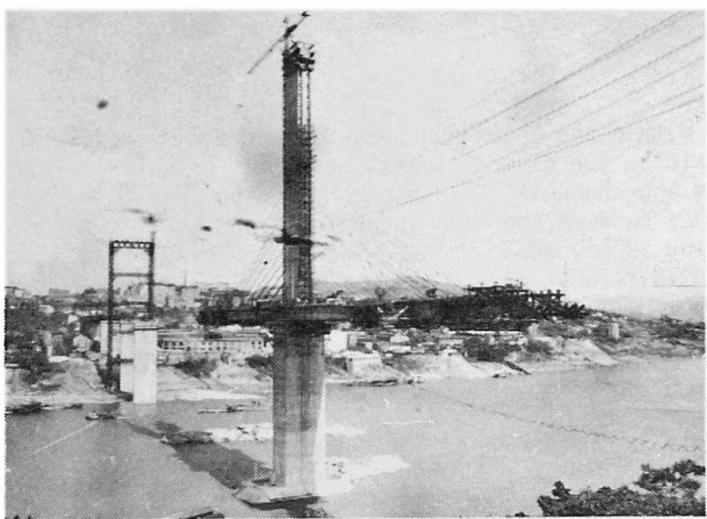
General view of Shimen Bridge construction Commission, consists of Urban Construction construction units, universities and colleges, etc.
